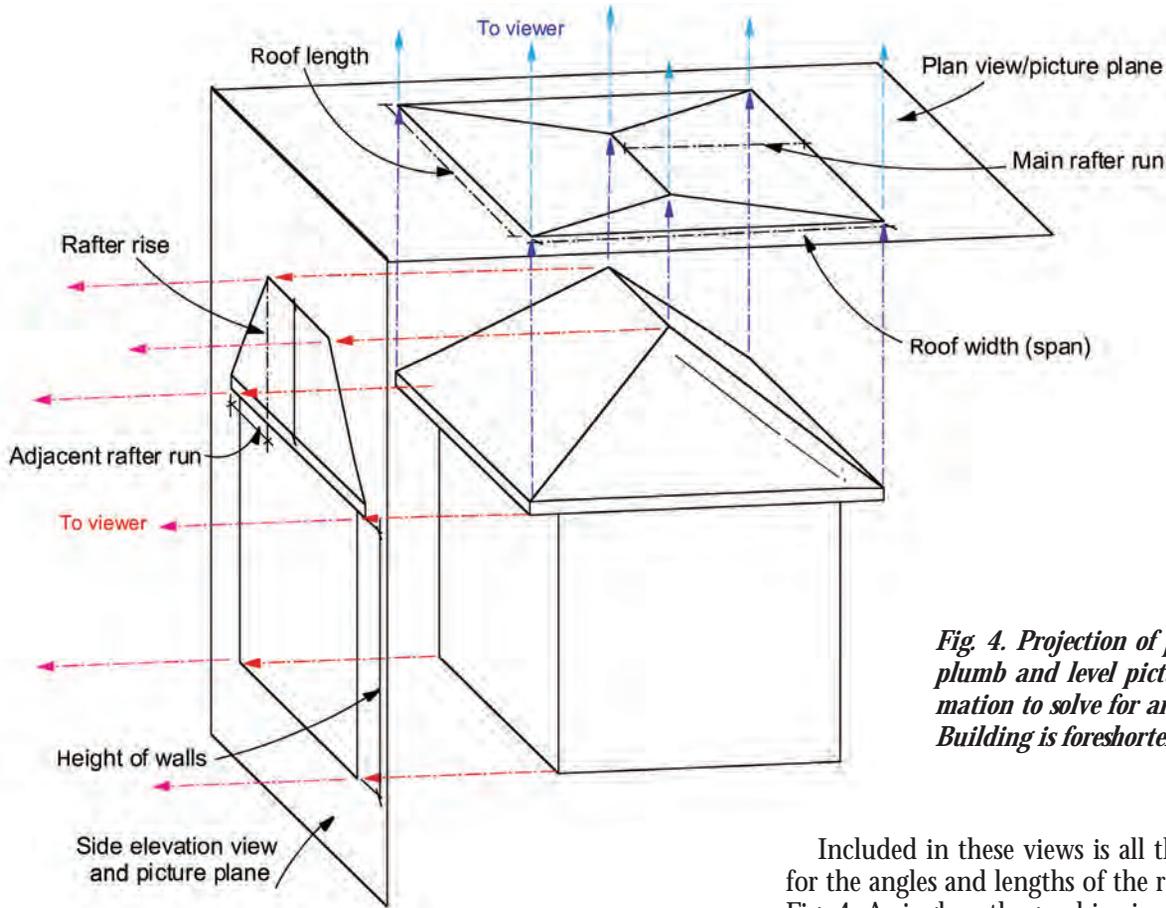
Projection of plan and elevation views through plumb and level picture planes reveals essential information to solve for angles and lengths of roof members. Building is foreshortened in this illustration.
